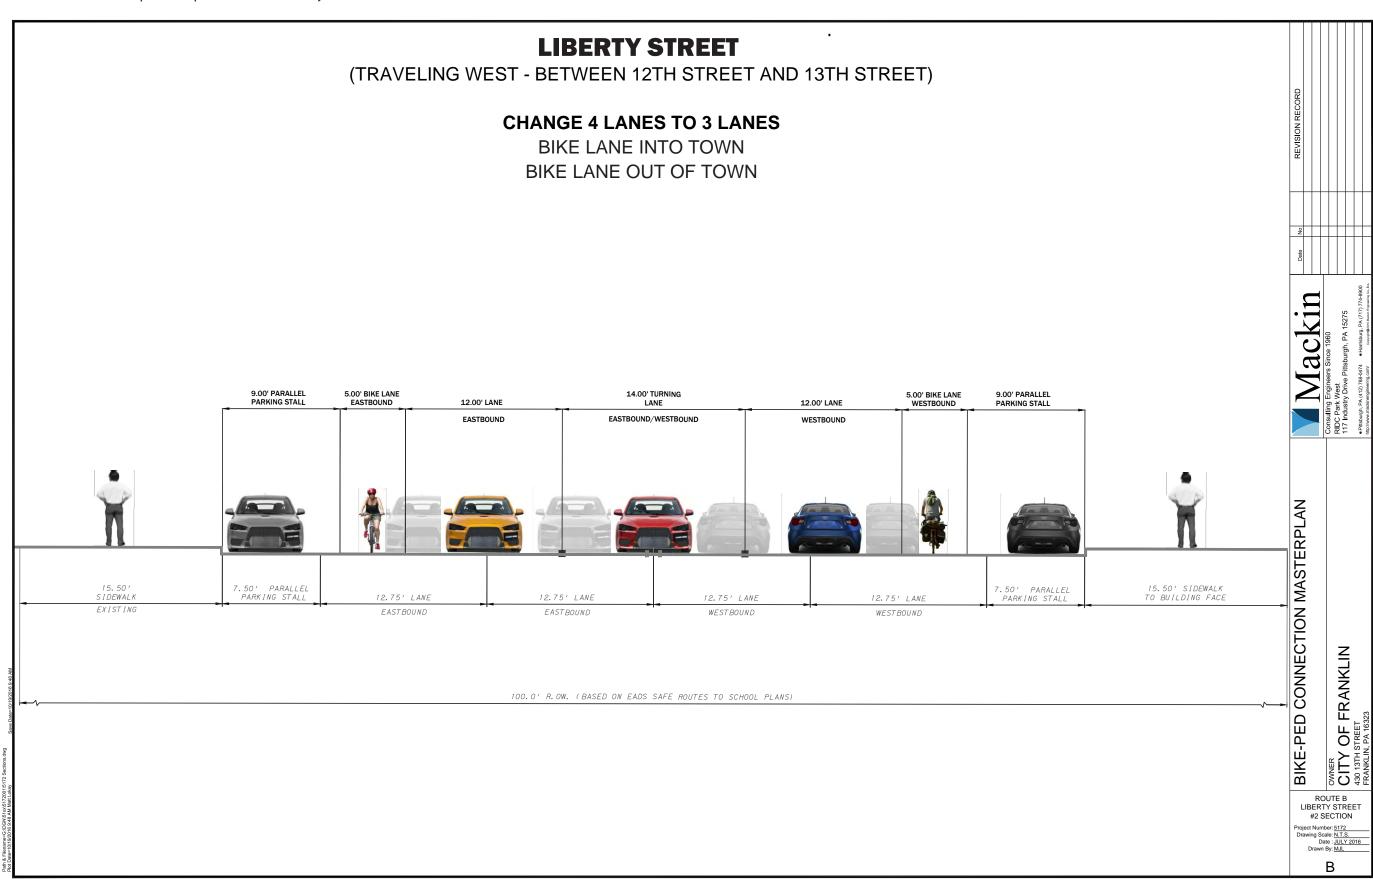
Cross Section of Proposed Improvements to Liberty Street between 12th and 13 Streets
